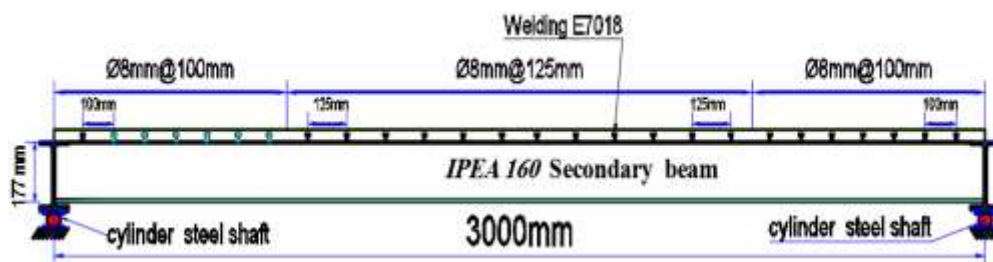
The chosen beams cross-section of full scale designed composite SB-RC Deck floor
